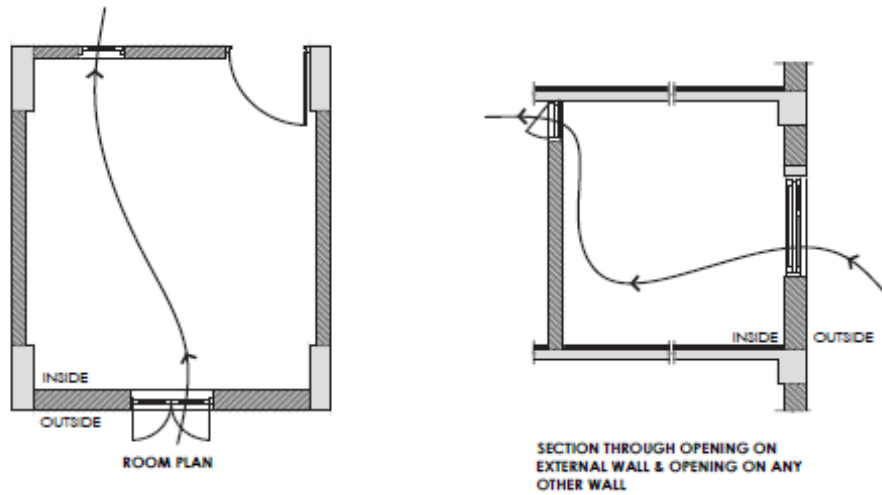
Openings on external wall and internal wall for cross ventilation (Guideline)
